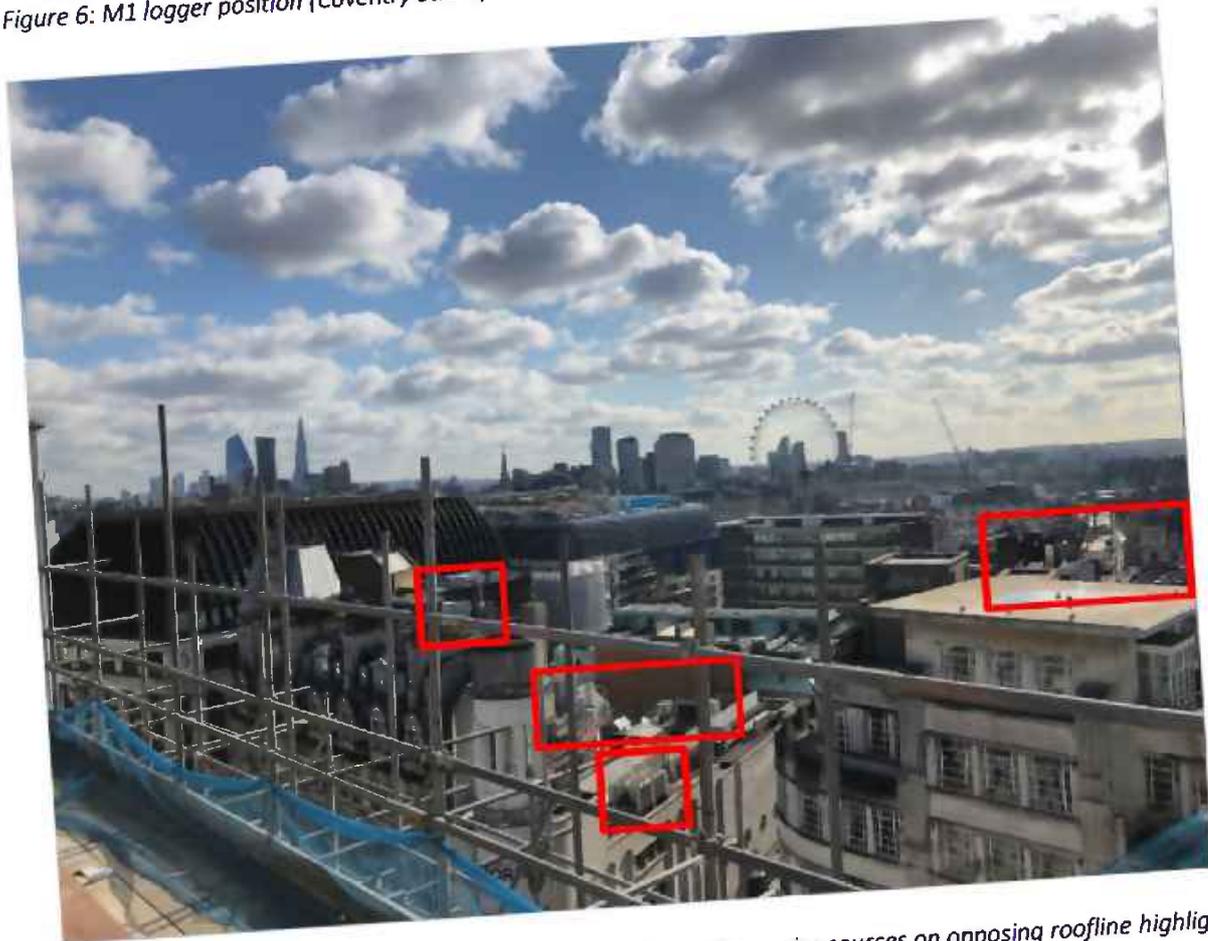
View from 12th floor (Coventry Street, above M1). Plant noise sources on opposing roofline highlighted.
